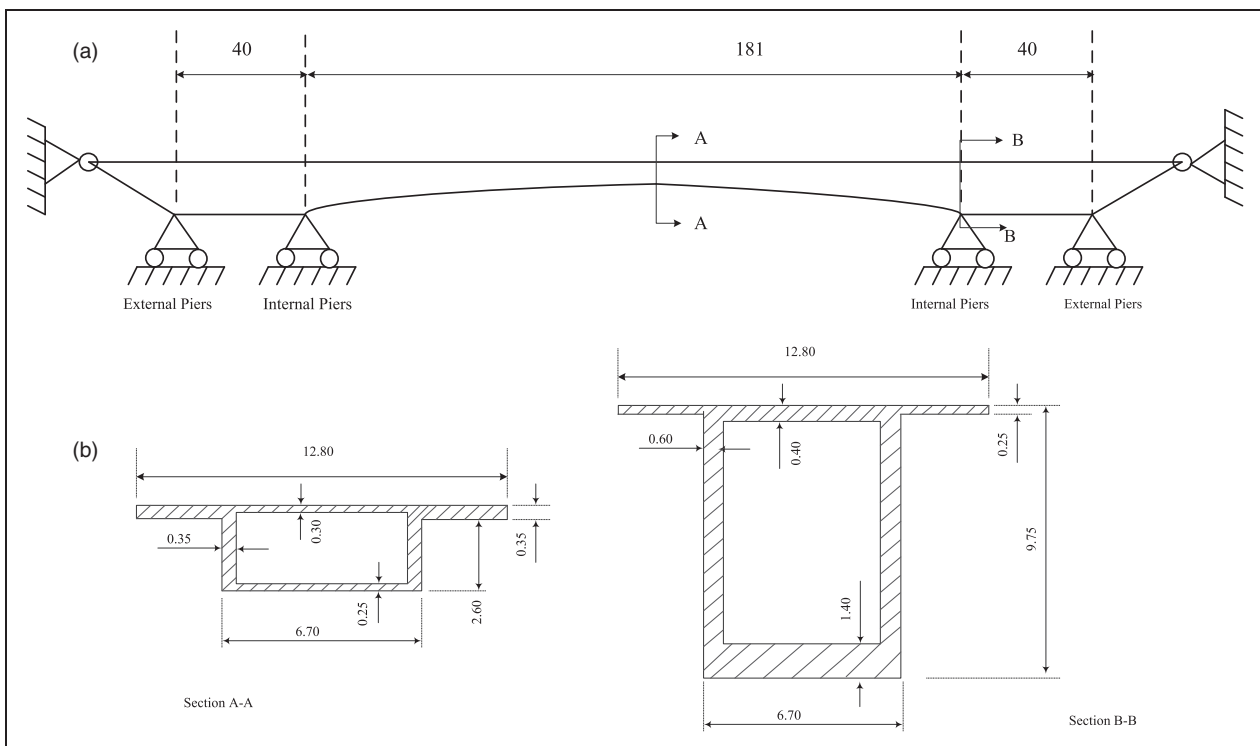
Details of Grand-Mere Bridge, all dimensions are in meters (m). (a) Schematic of Grand-Mere Bridge (longitudinal view); (b) cross-section of the bridge at the piers and mid span.
